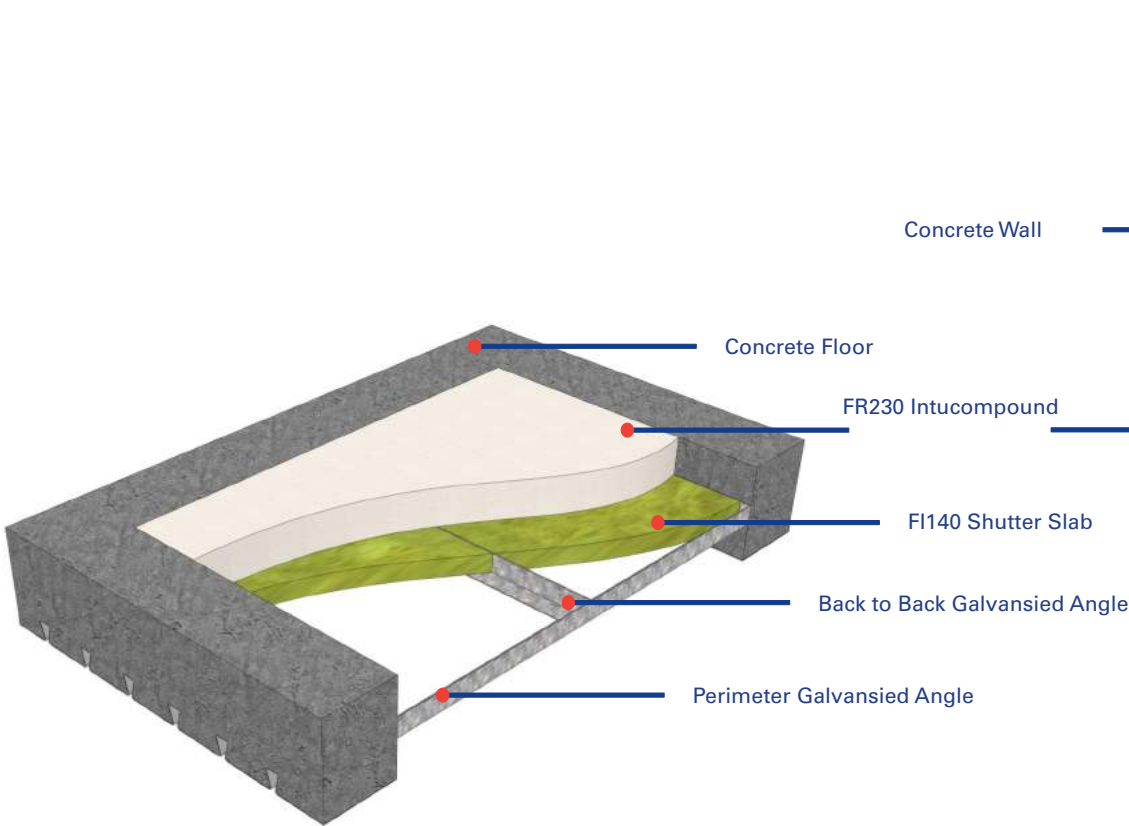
Detail A - Loadbearing seals up to 1100mm x 1100mm (1.21m2)
